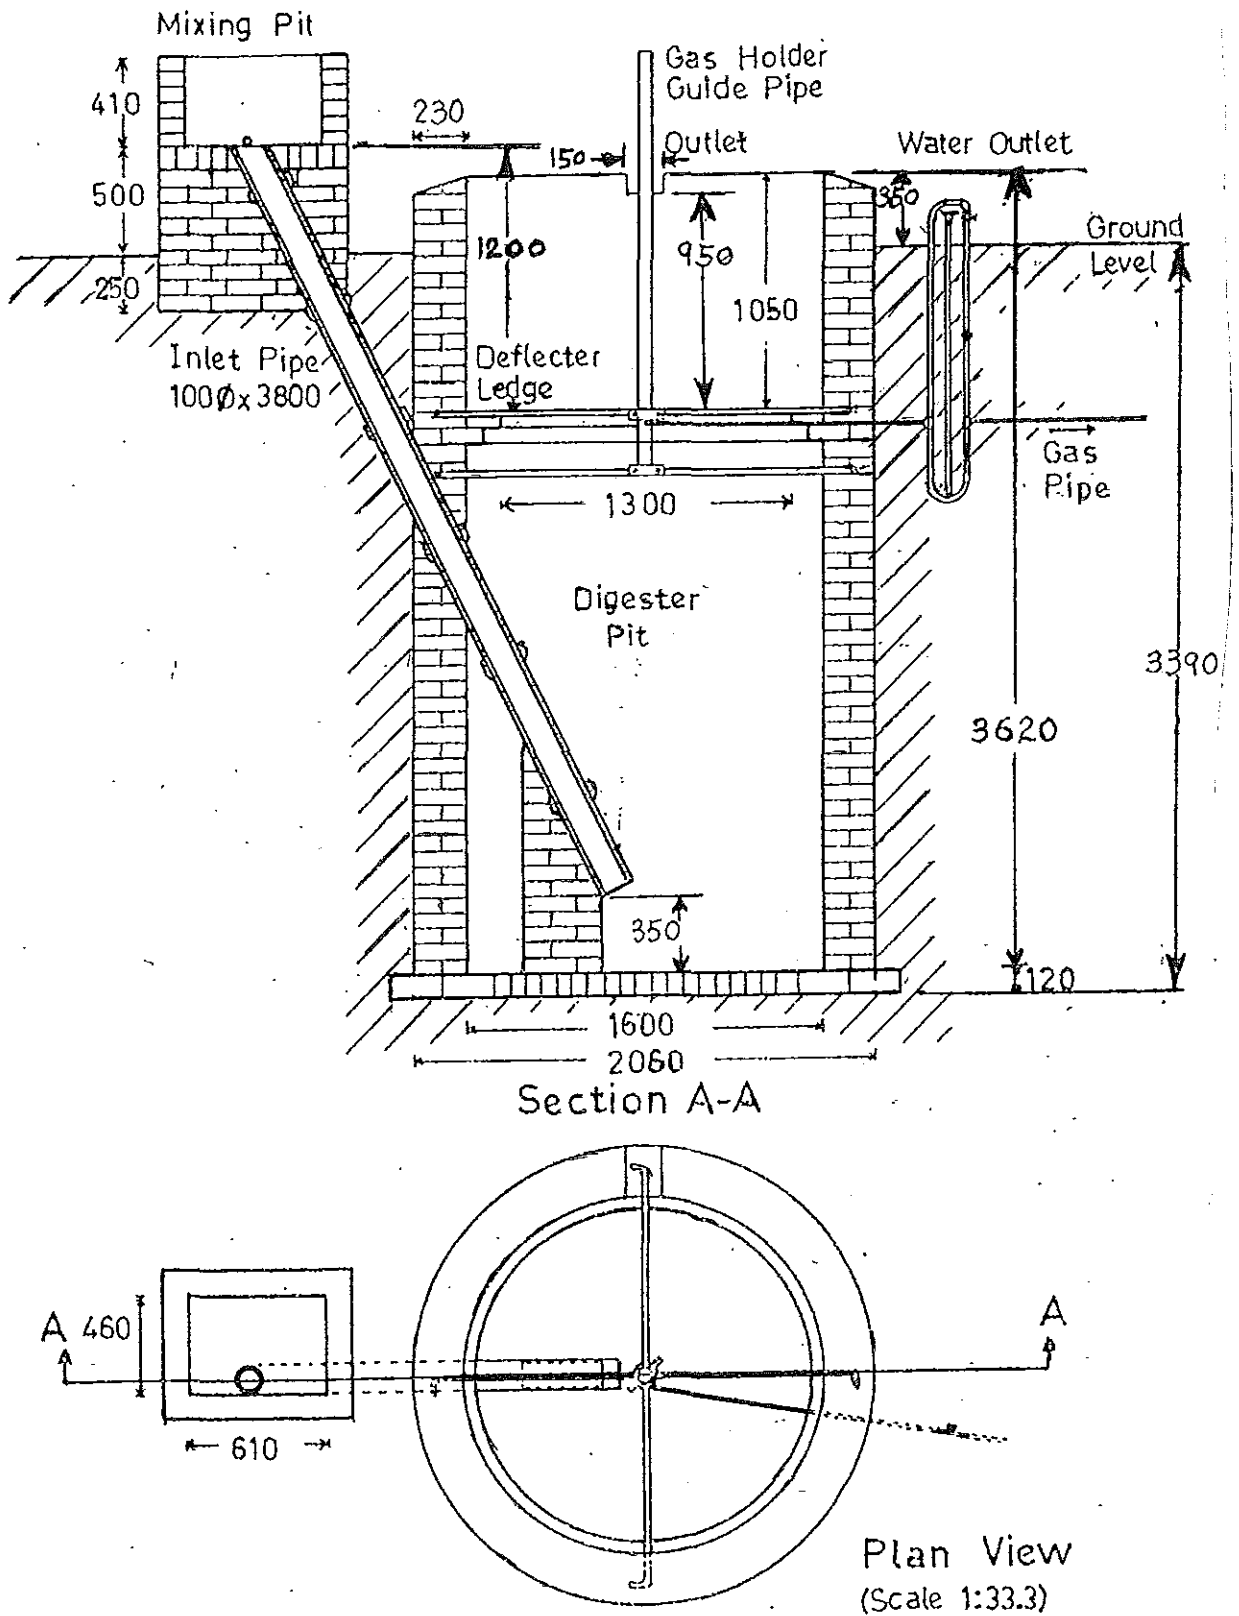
Floating Drum Design SD100 (Straight Type)
